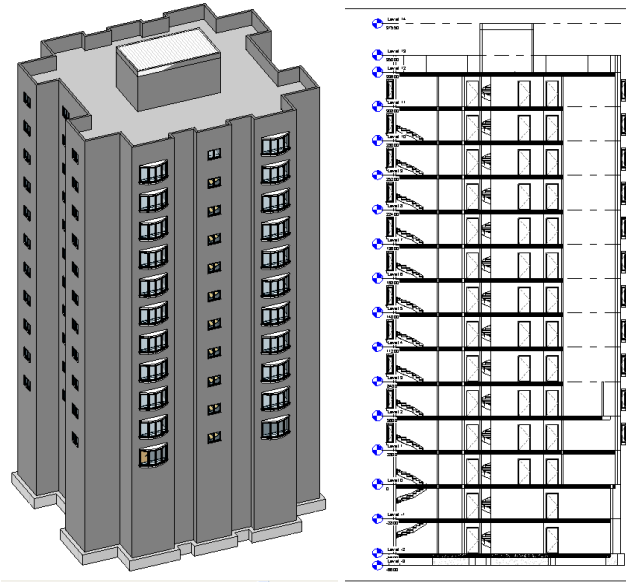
Revit Architecture Model and section created from Kiptaş drawings
